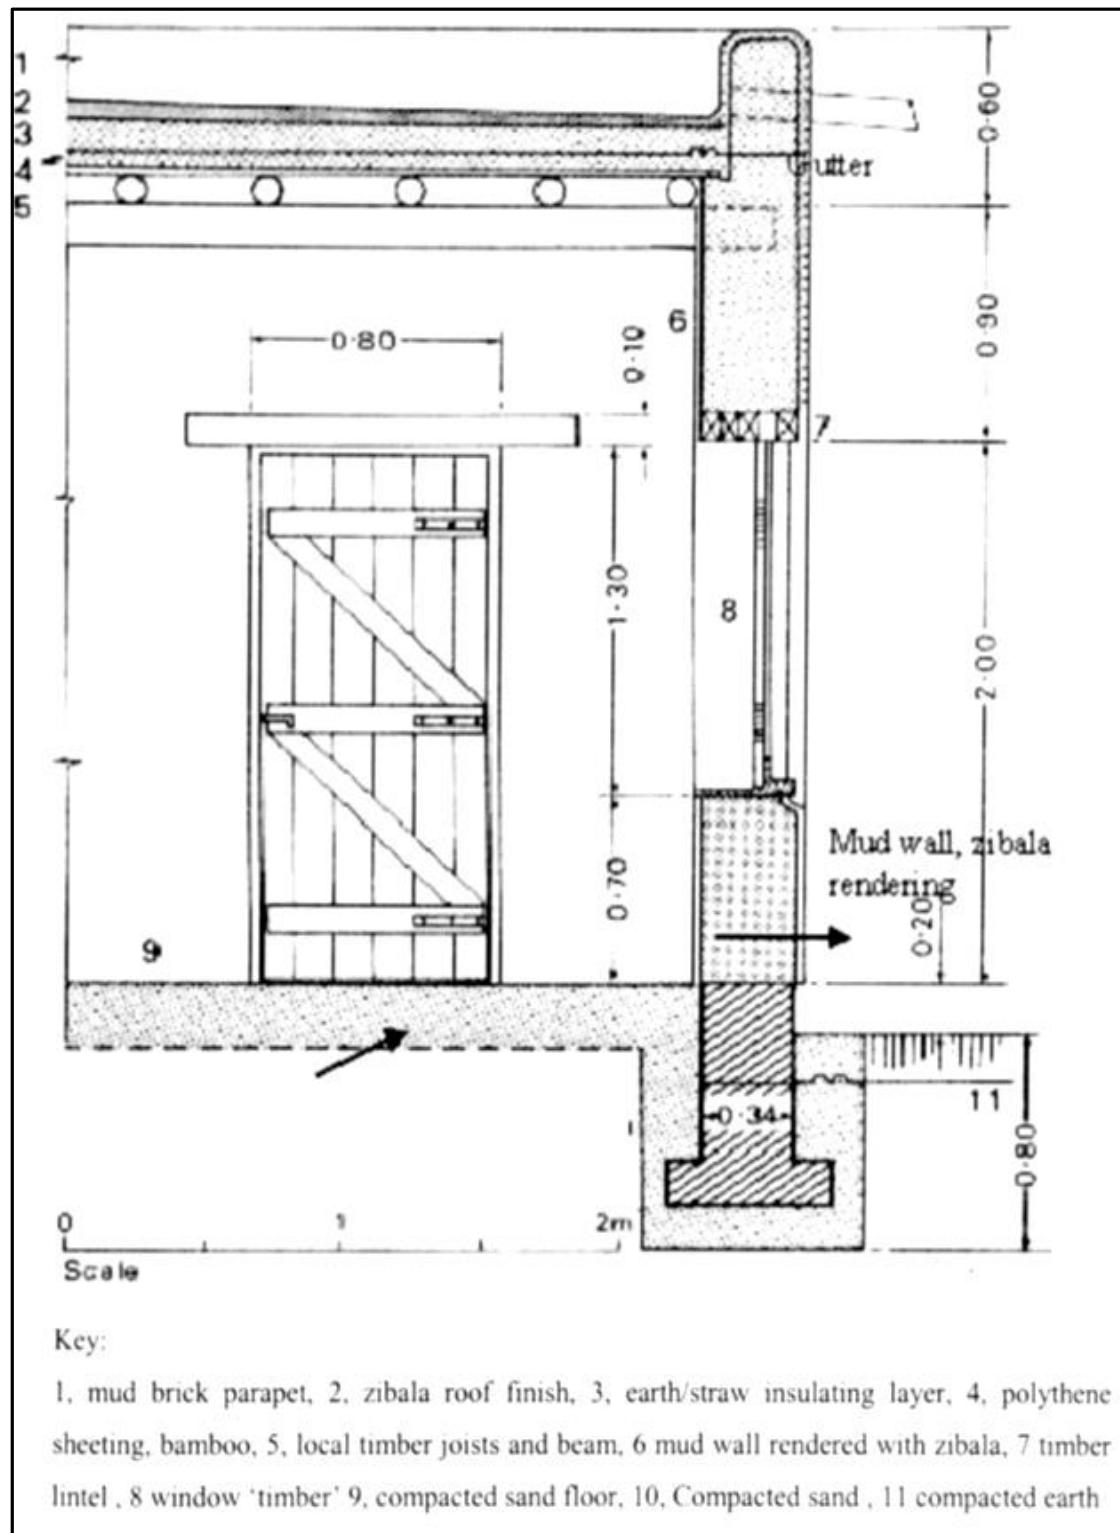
Enhanced mud house construction (Taha, 2005)
